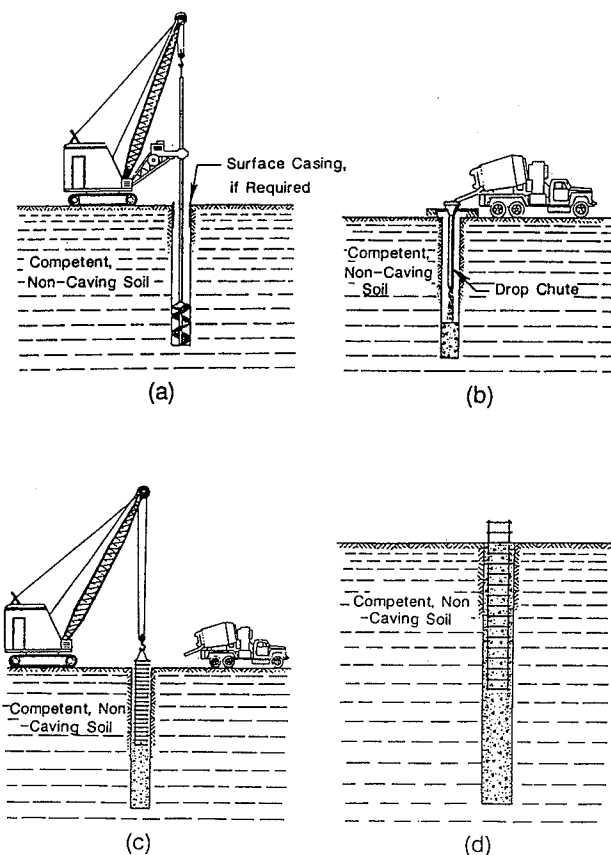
Dry method of construction: (a) initiating drilling, (b) starting concrete pour, (c) placing rebar cage, (d) completed shaft. (From Reese and O'Neill, 1988)
